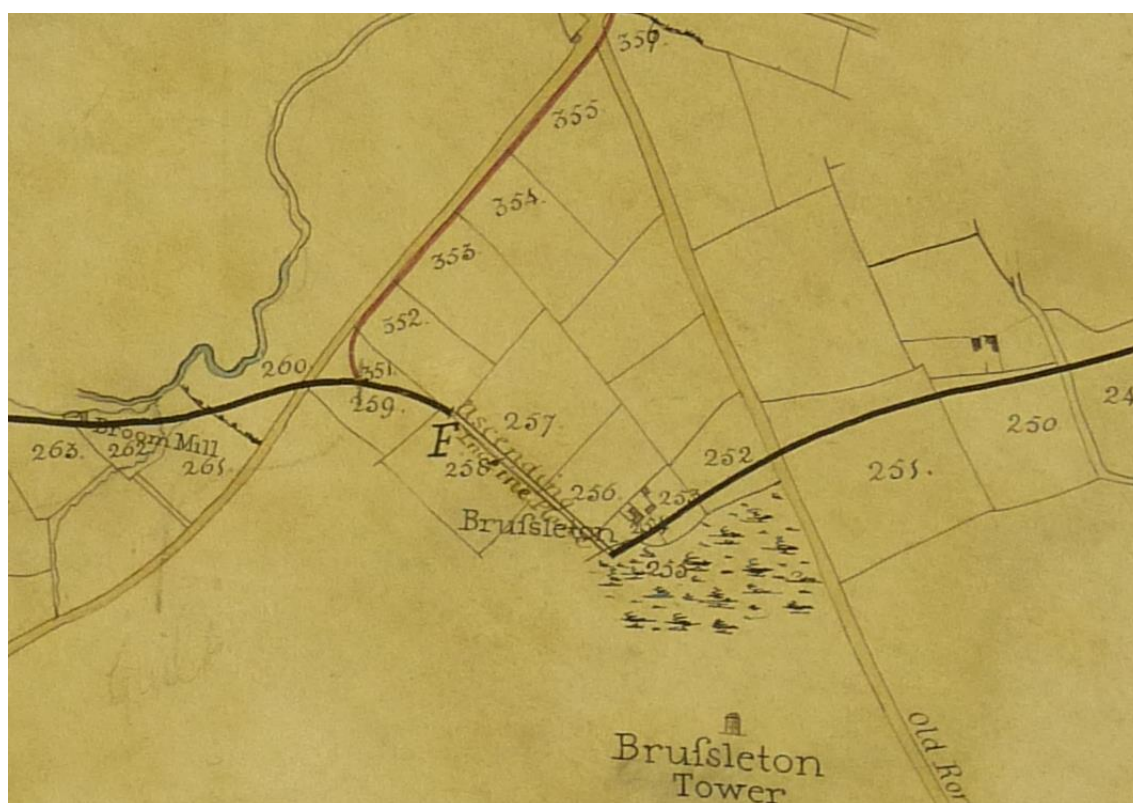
Overton's plan of 1820 showing the ascending incline further west near Brusselton Farm and then crossing the Roman Road Dere Street (now Haggs Lane) towards Low West Thicklely Farm. Stephenson was to alter this arrangement and place the incline further east as he believed that Overton's incline was too steep and would lead to accidents
